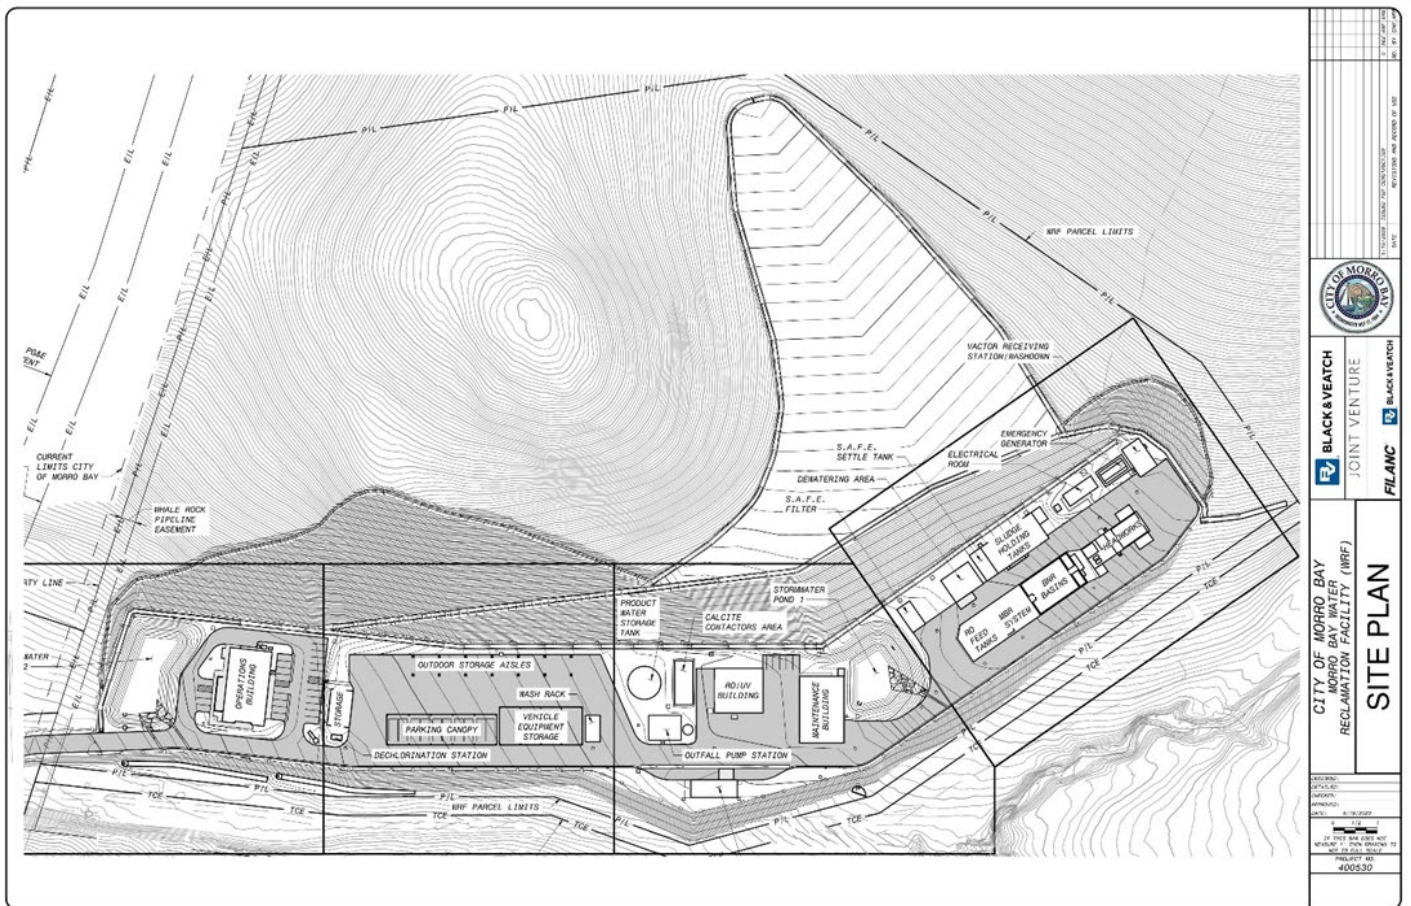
Morro Bay Water Reclamation Facility Site Plan
